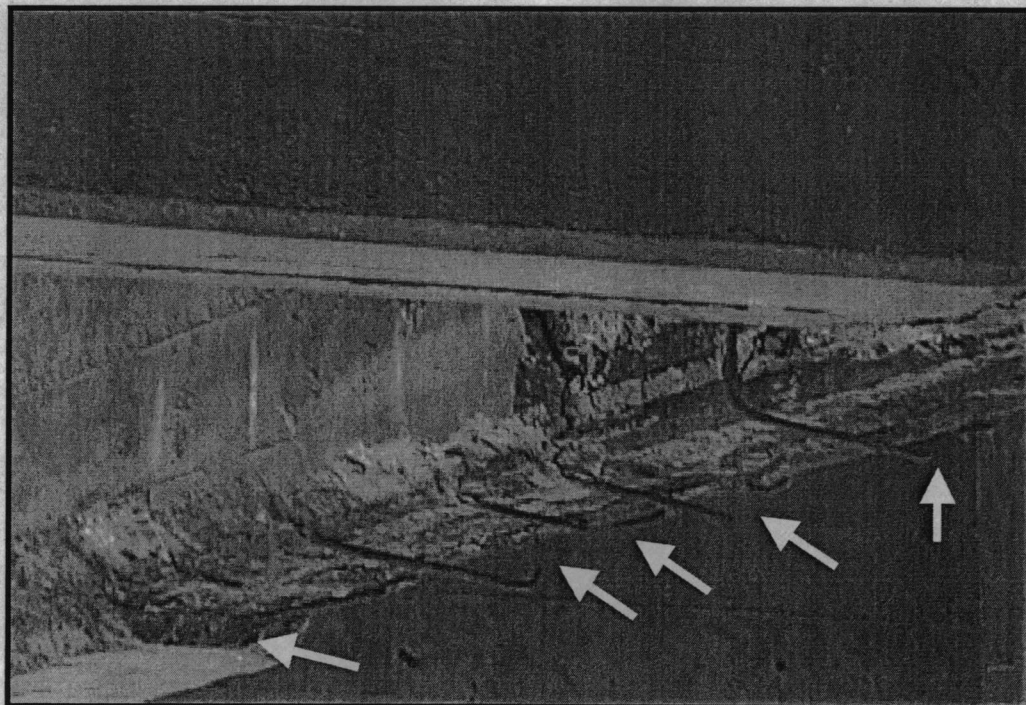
Complete loss of section on a coastal bridge girder constructed in 1946.
